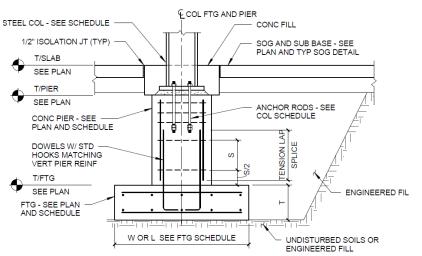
Typical Colum Footing with Pier (S-3.01, Detail 1)
